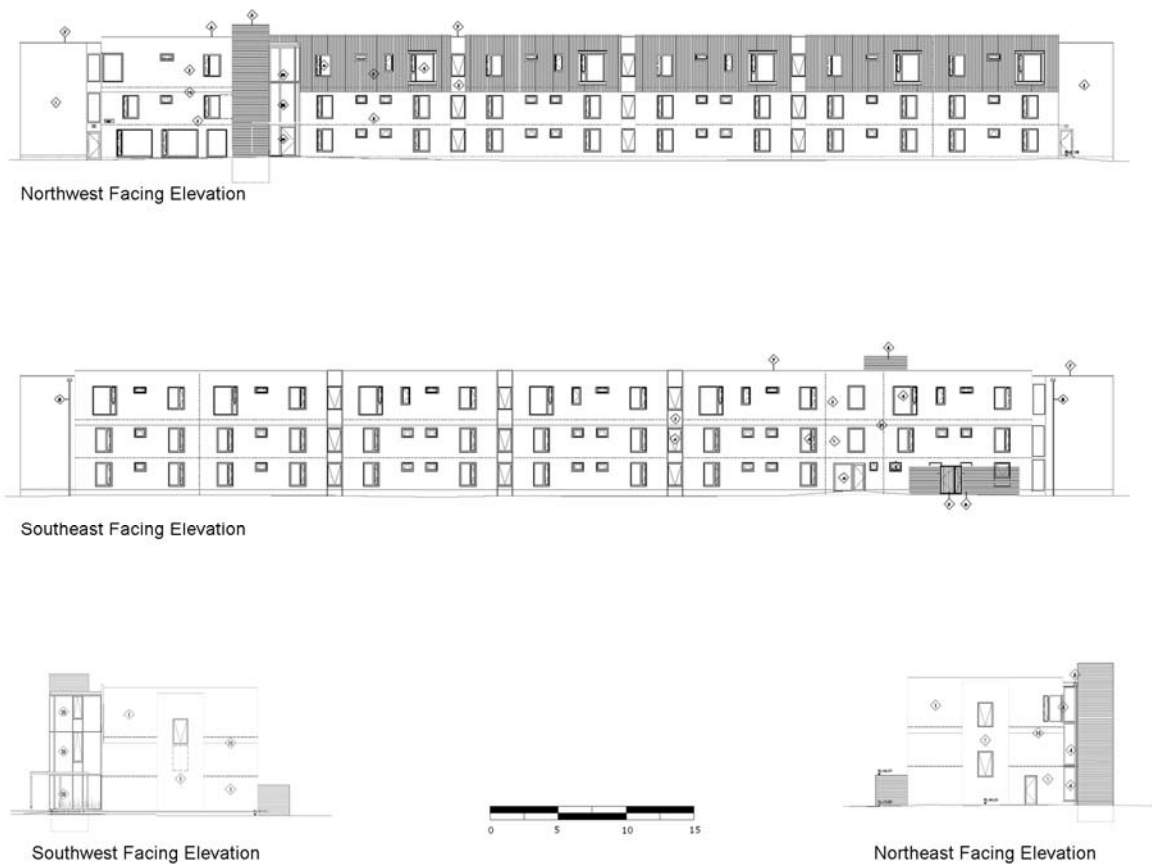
Elevations of proposed development [DLR Co. Co., 2014]
